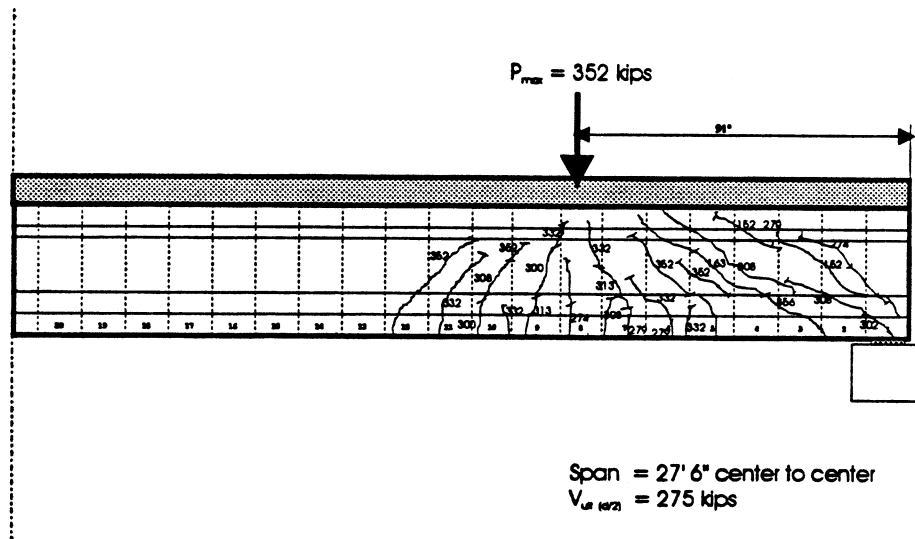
Cracking Pattern for Girder F12S
